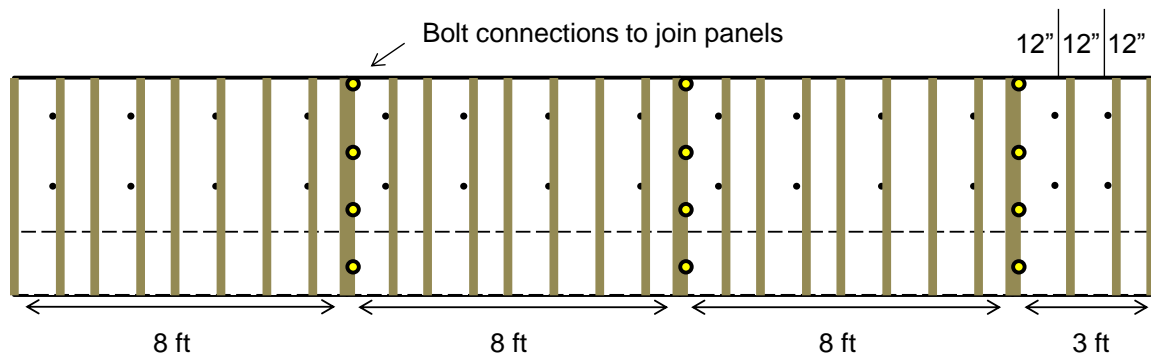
Distribution of studs on the formwork sheathing. (1-in. = 2.54 cm)
